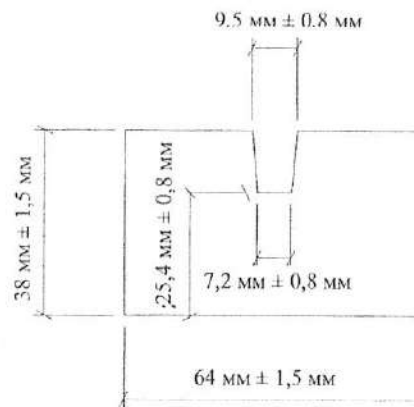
Detail of Sk-beam connection (64x38); dimensions in mm
